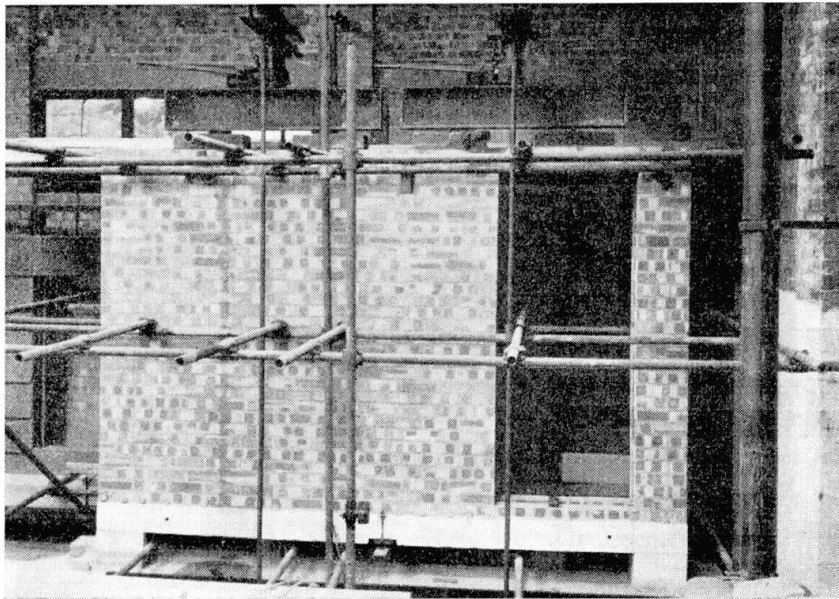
Vertical loading tests on a cavity brick wall carried by a reinforced concrete beam, with a door opening near the supports.
